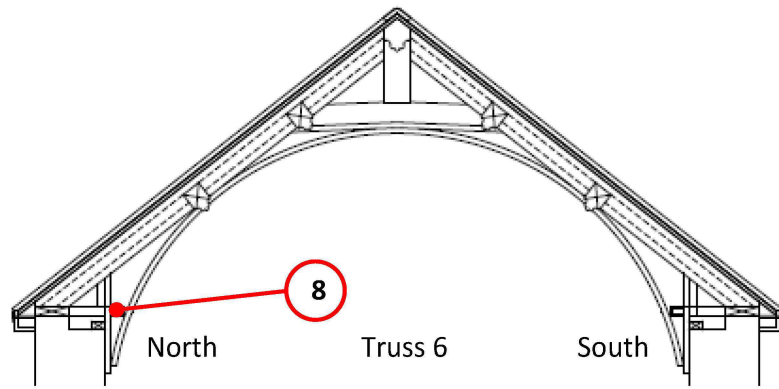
f: Sections through the nave roof trusses to locate sampled timbers
